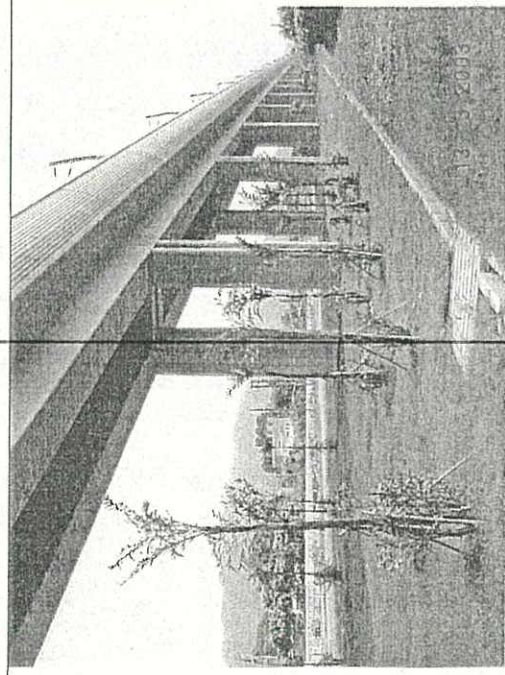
Landscape Planting at Tin Sum Tsuen (Piers 1-6)
